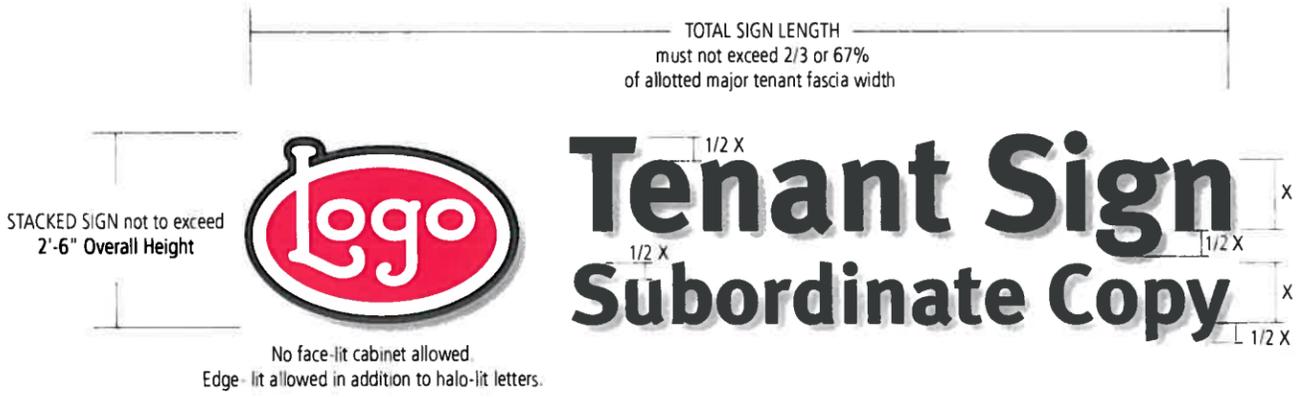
Exhibit B | Typical Retail Tenant Building Sign- Stacked Two Line with Logo Layout
